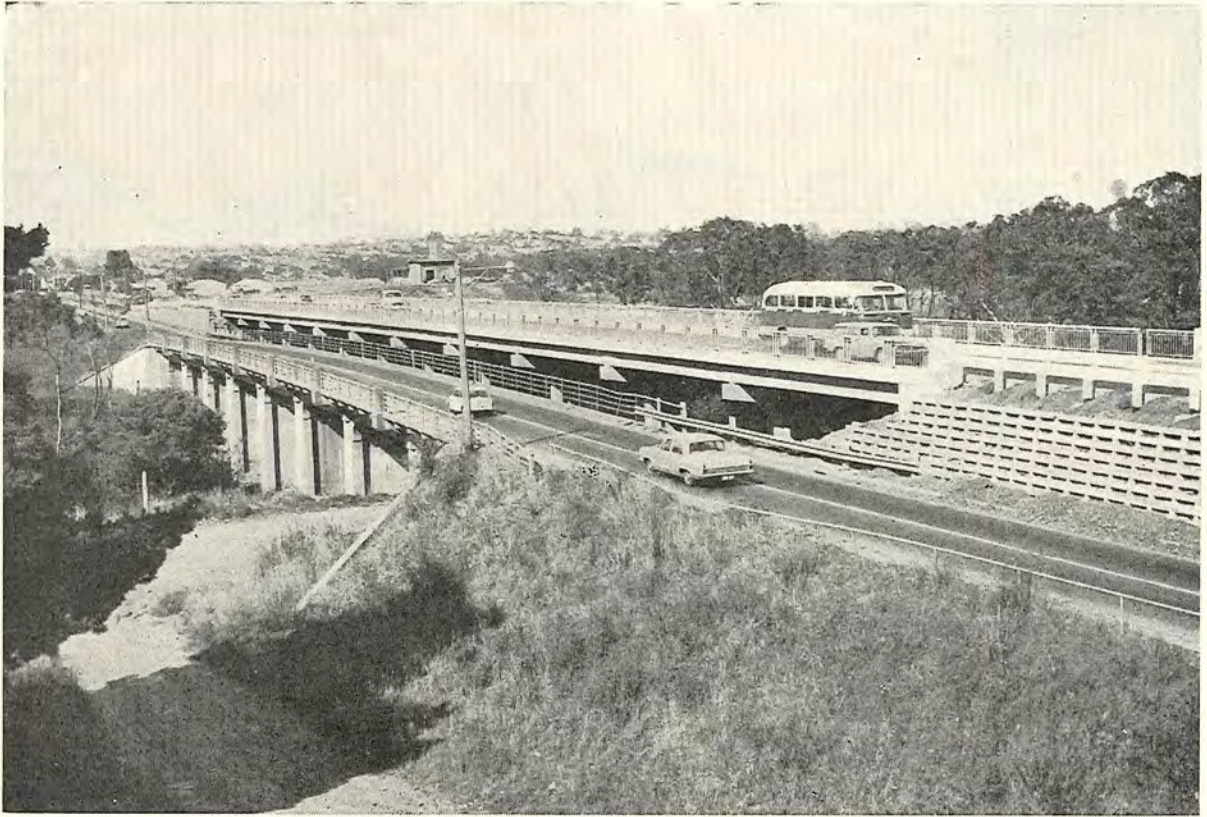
New Duplicate Bridge over the Yarra River on Burke Road at the boundaries of the Cities of Camberwell, Kew and Heidelberg.
